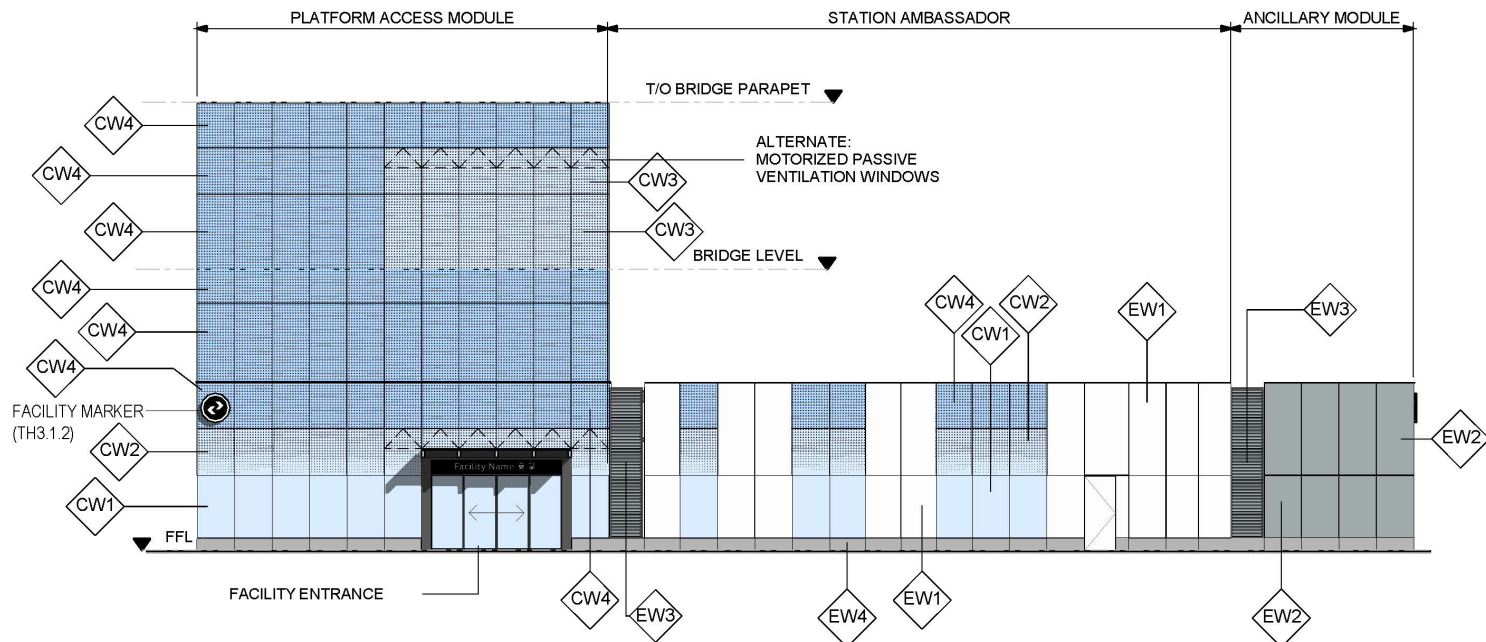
Staffed Station building (bridge platform access) front elevation, showing exterior finishes, Platform Access, Station Ambassador and Ancillary Modules
